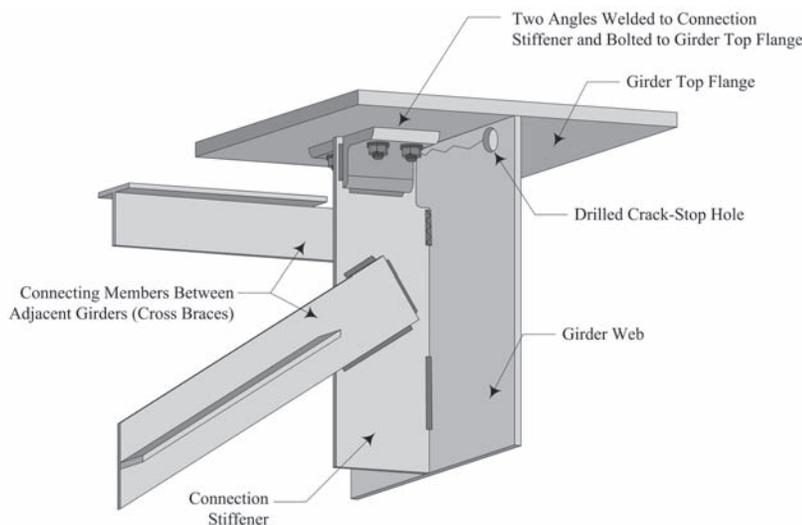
Repair and retrofit for Tuttle Creek Bridge.
